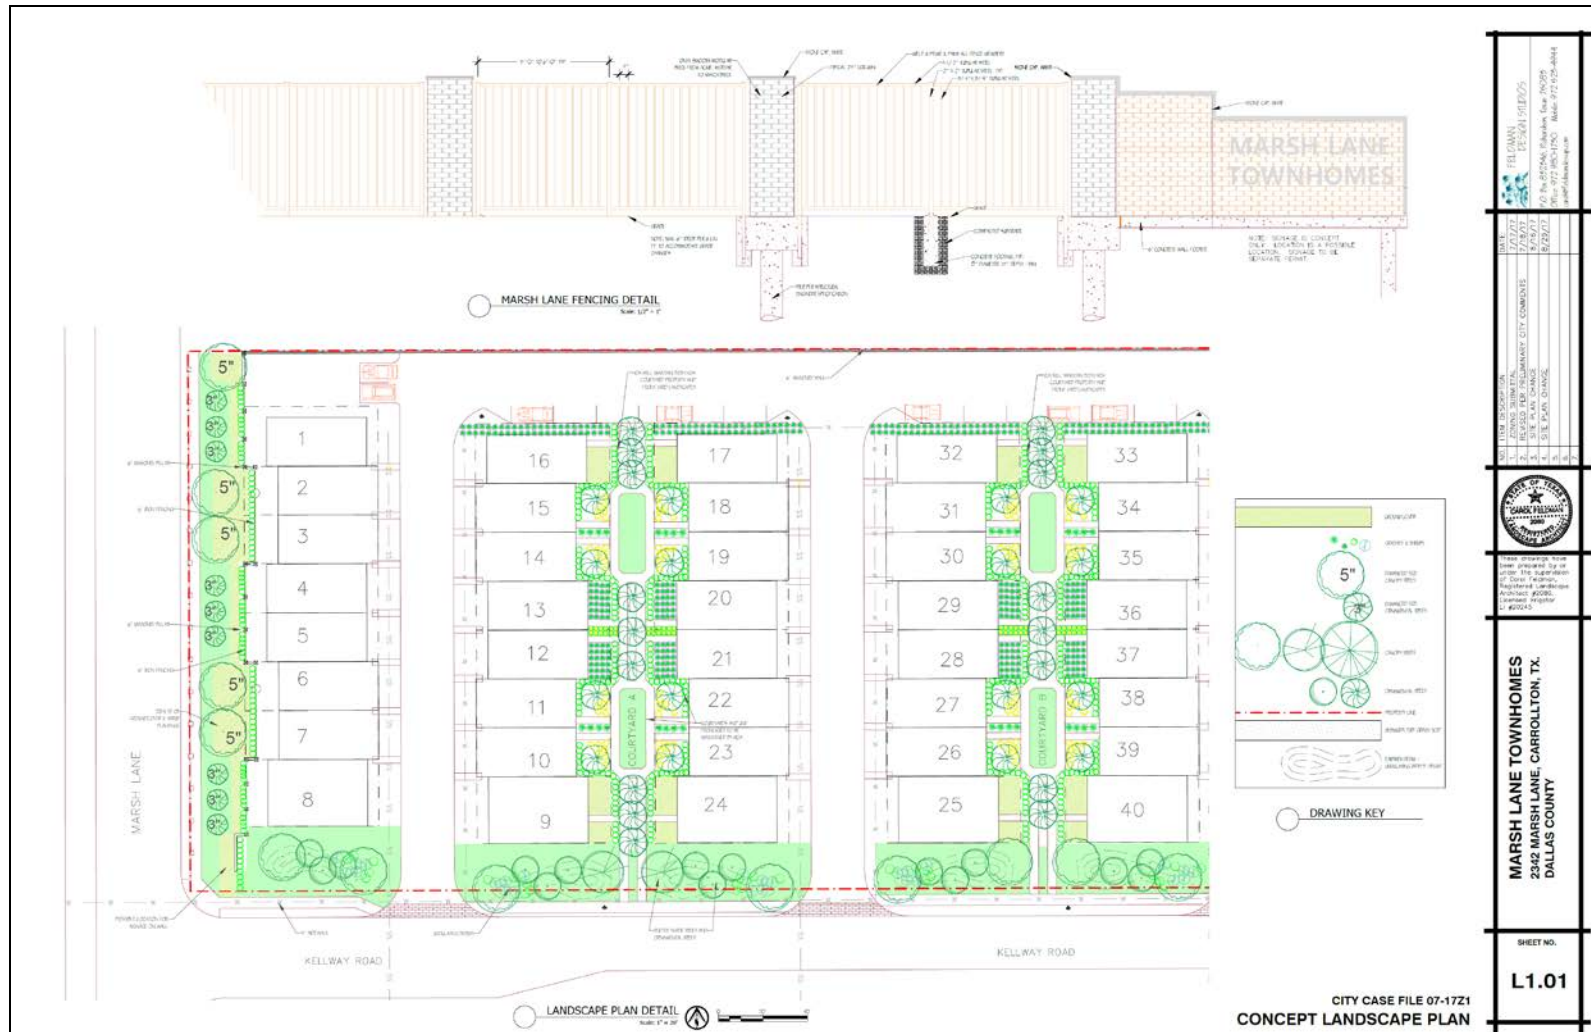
EXHIBIT D Conceptual Landscape Plan 3 of 4
